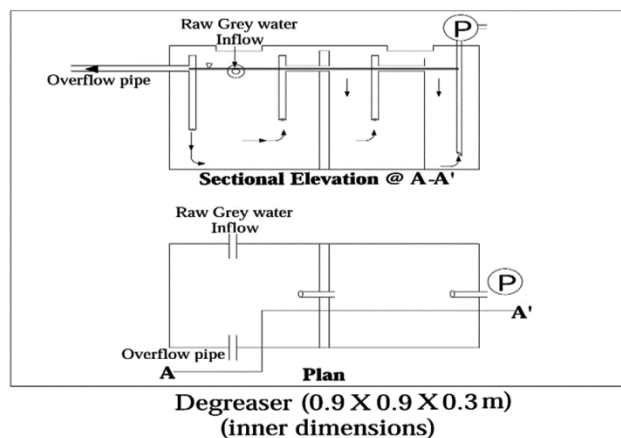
Schematic diagram of degreasing tank with baffle wall arrangement
